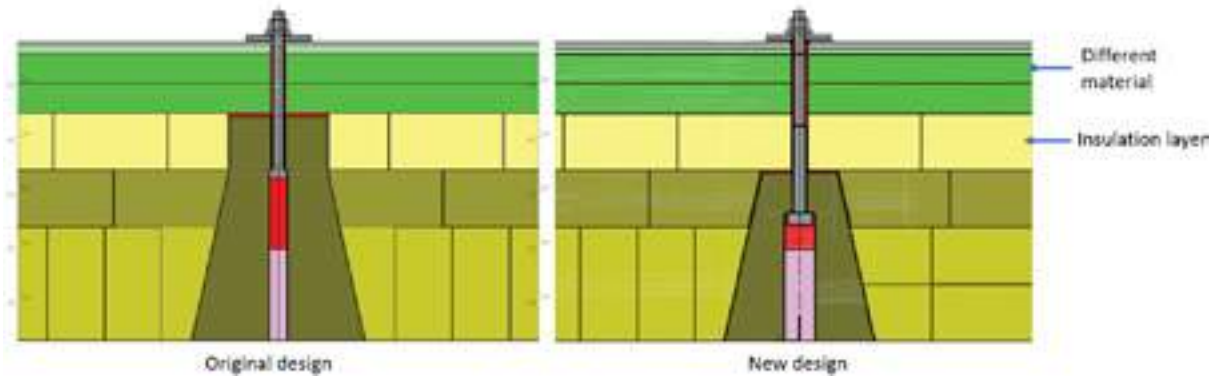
Re-design of the the anchor brick construction of the furnace wall
